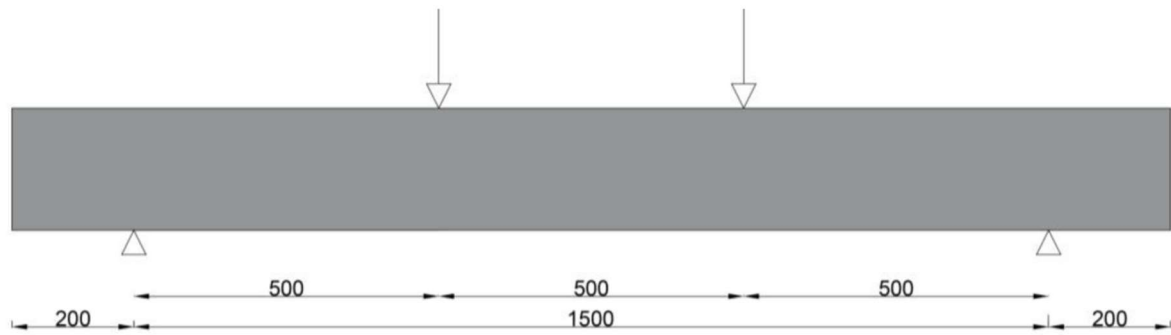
4-point bending test setup in which the reinforced hybrid concrete beam was tested (Huang, 2017)
